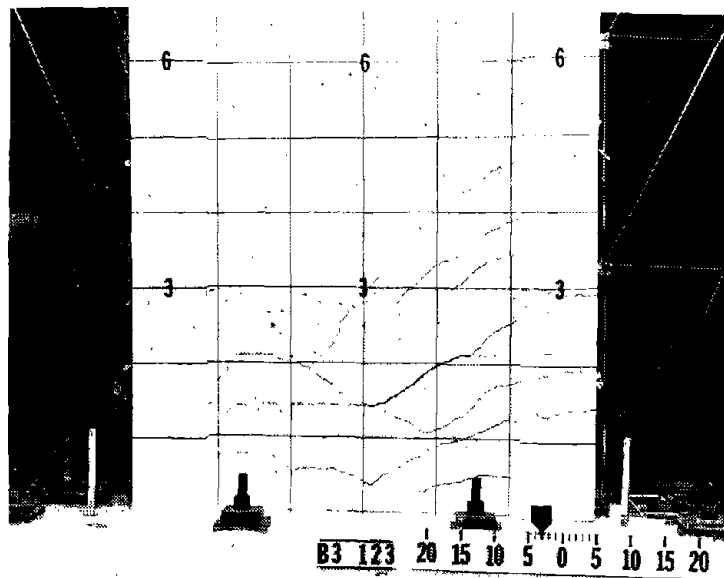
Cracking Pattern at -3 in. Deflection for Specimen B3
